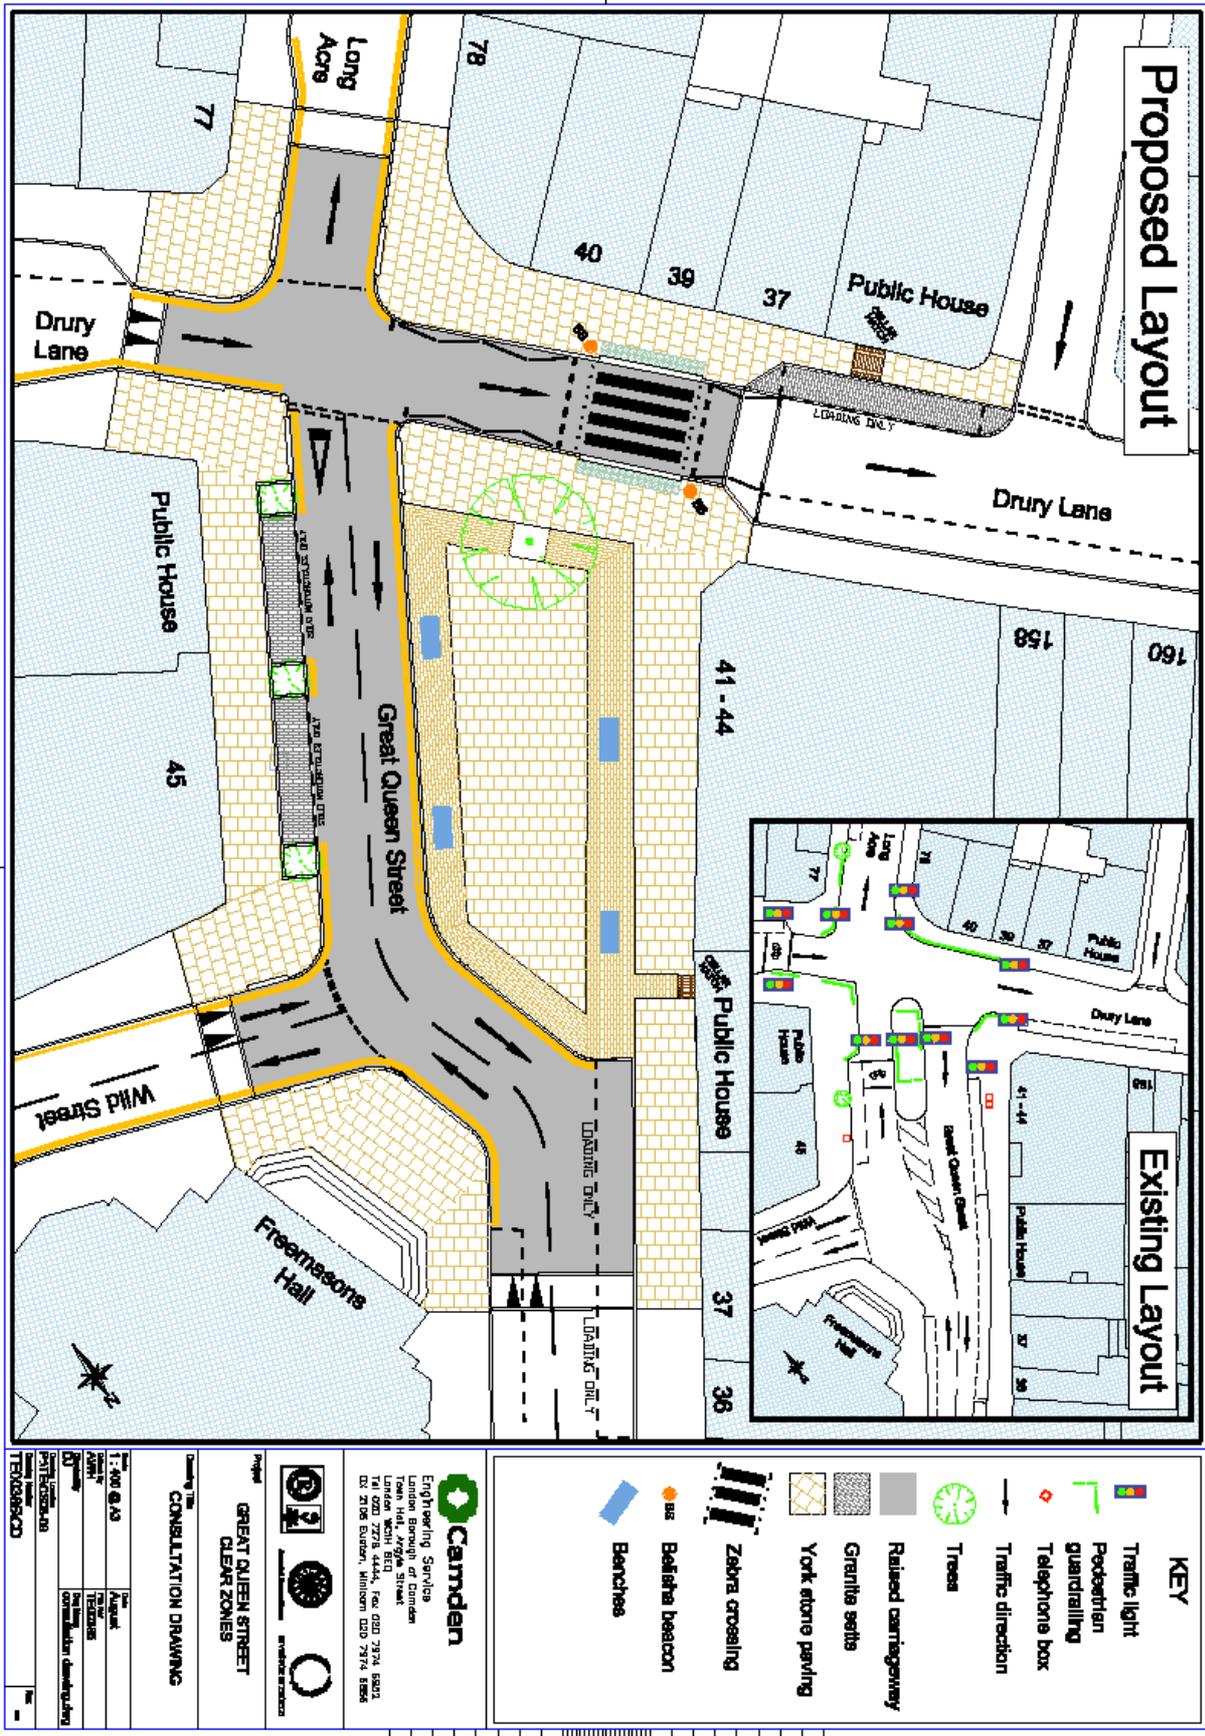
The consultation plan shows the proposed scheme in the large plan and the old road layout in the small, inset box.
